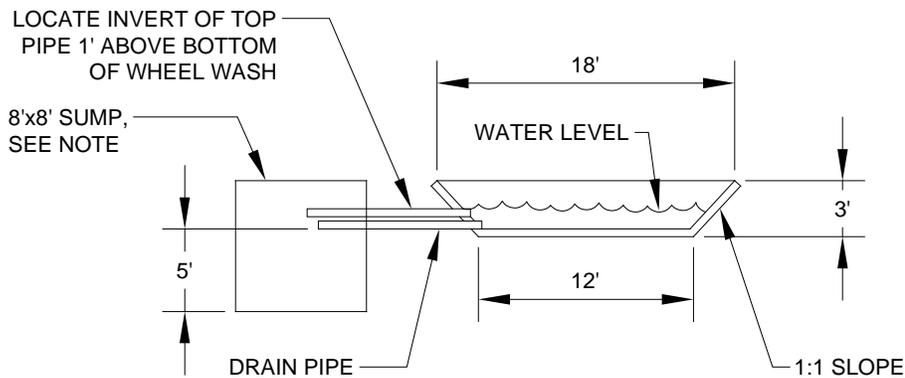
B WHEEL WASH AND PAVED CONSTRUCTION ENTRANCE
